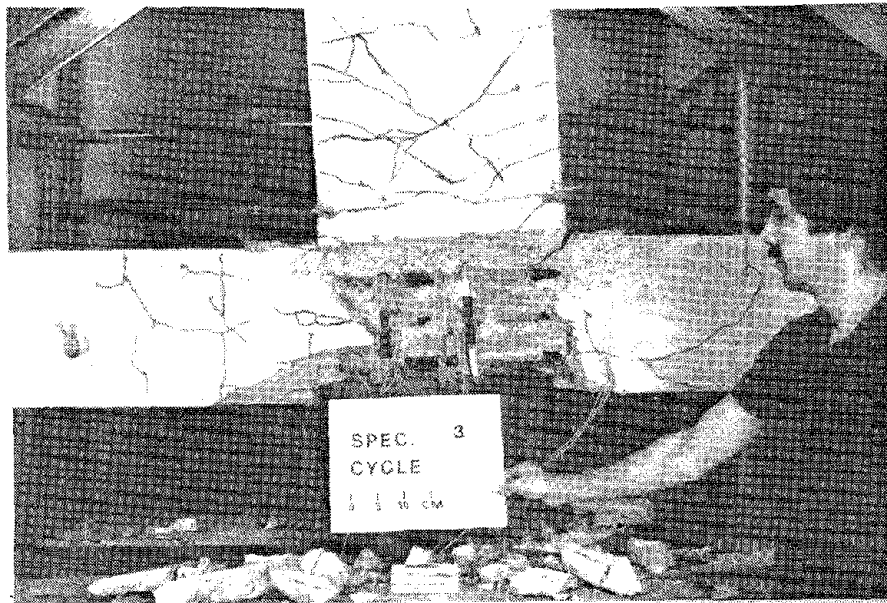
Spalling of Cover Concrete on the joint of a Bare Specimen.
